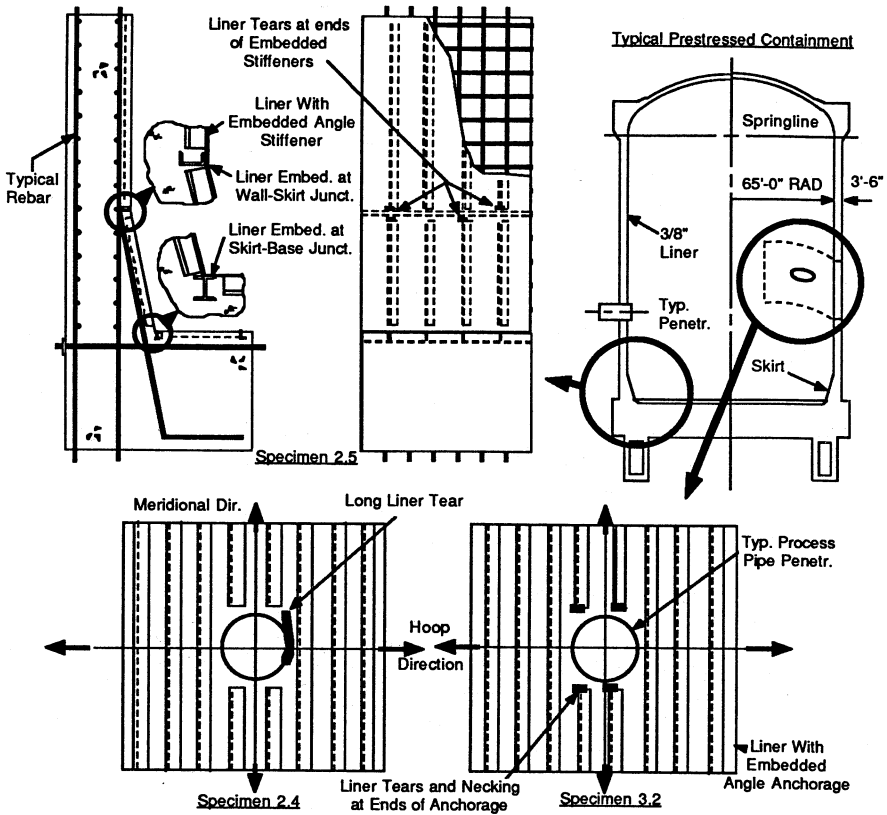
CTL Tests. Upper: Specimen 2.5, Wall-Base Juncture. Lower: Specimens 2.4 & 3.2, Prestressed Cont. Wall Elements
